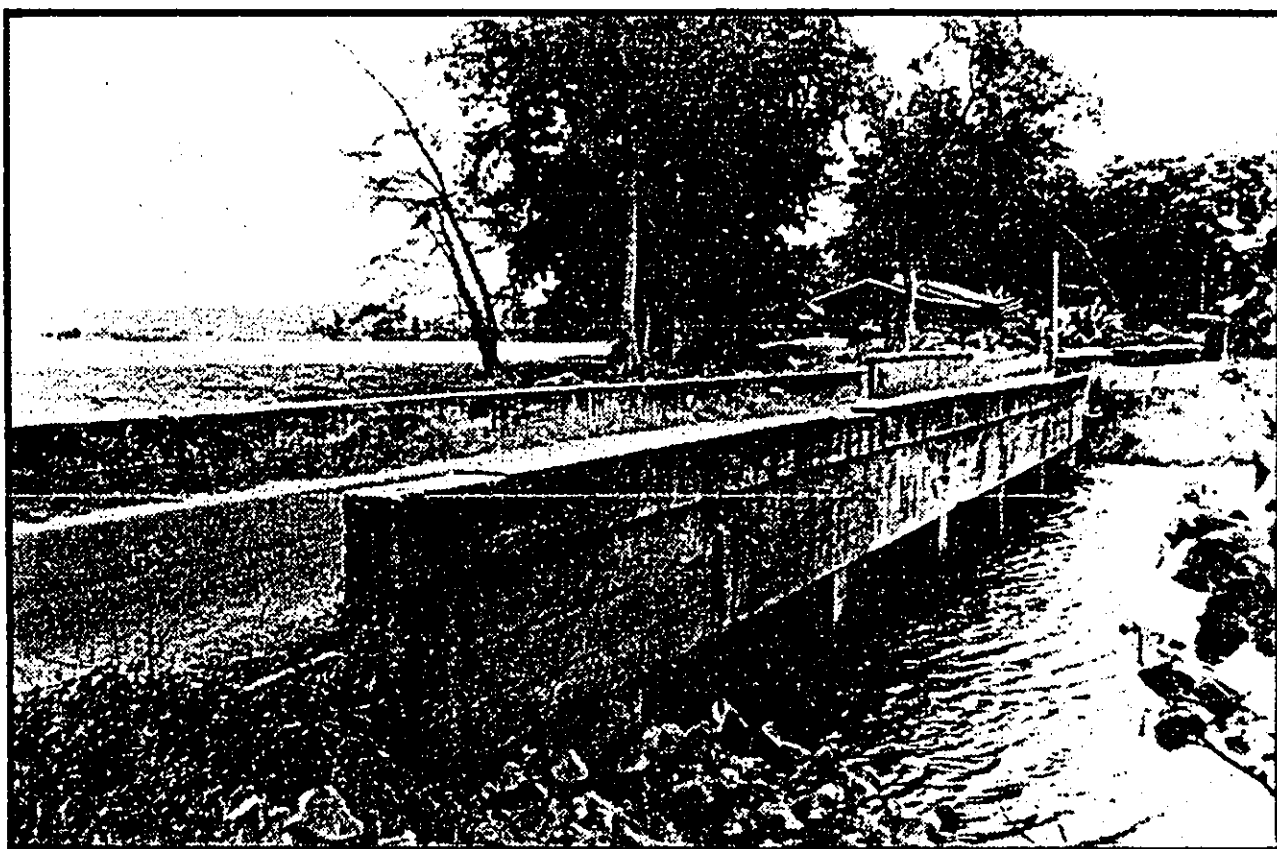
The Waipa Bridge looking east. Note the two different segments; the shorter one (background) is narrower than the 1934 extension.
